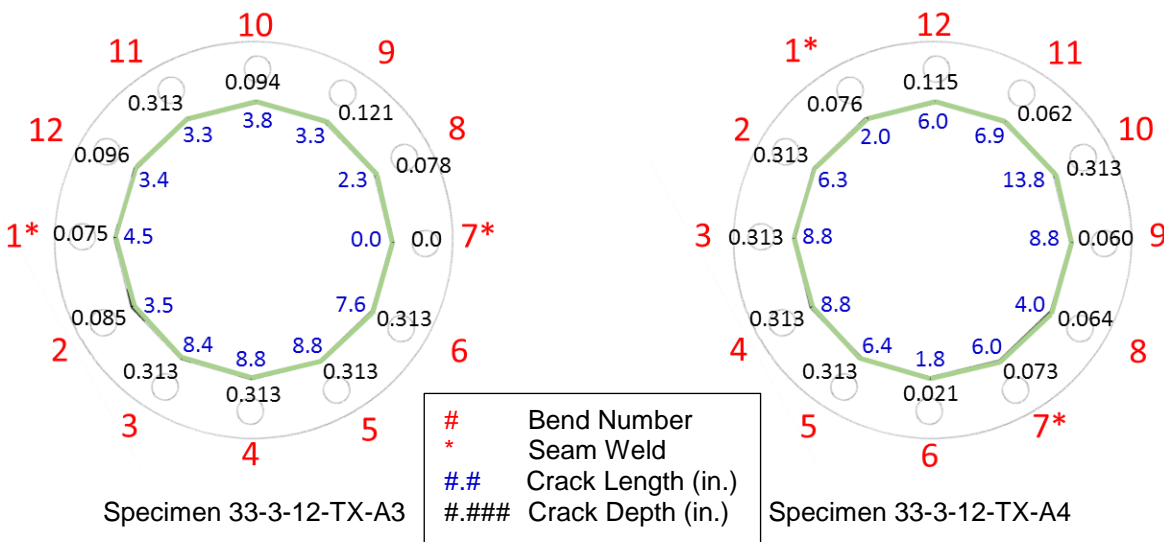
Specimens 33-3-12-TX-A3 and 33-3-12-TX-A4: Cracks after 66.2 Million Fatigue Cycles in Test 6
